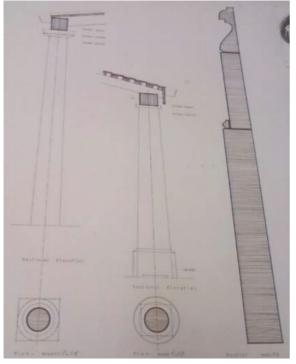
Details of columns on north elevation (left), in central courtyard (centre) and detail of skirting (right)
